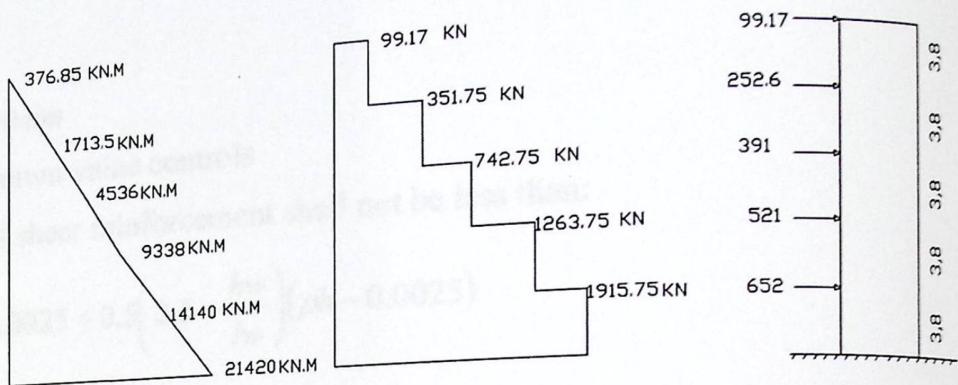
Moment and Shear Diagram of the Shear Wall
